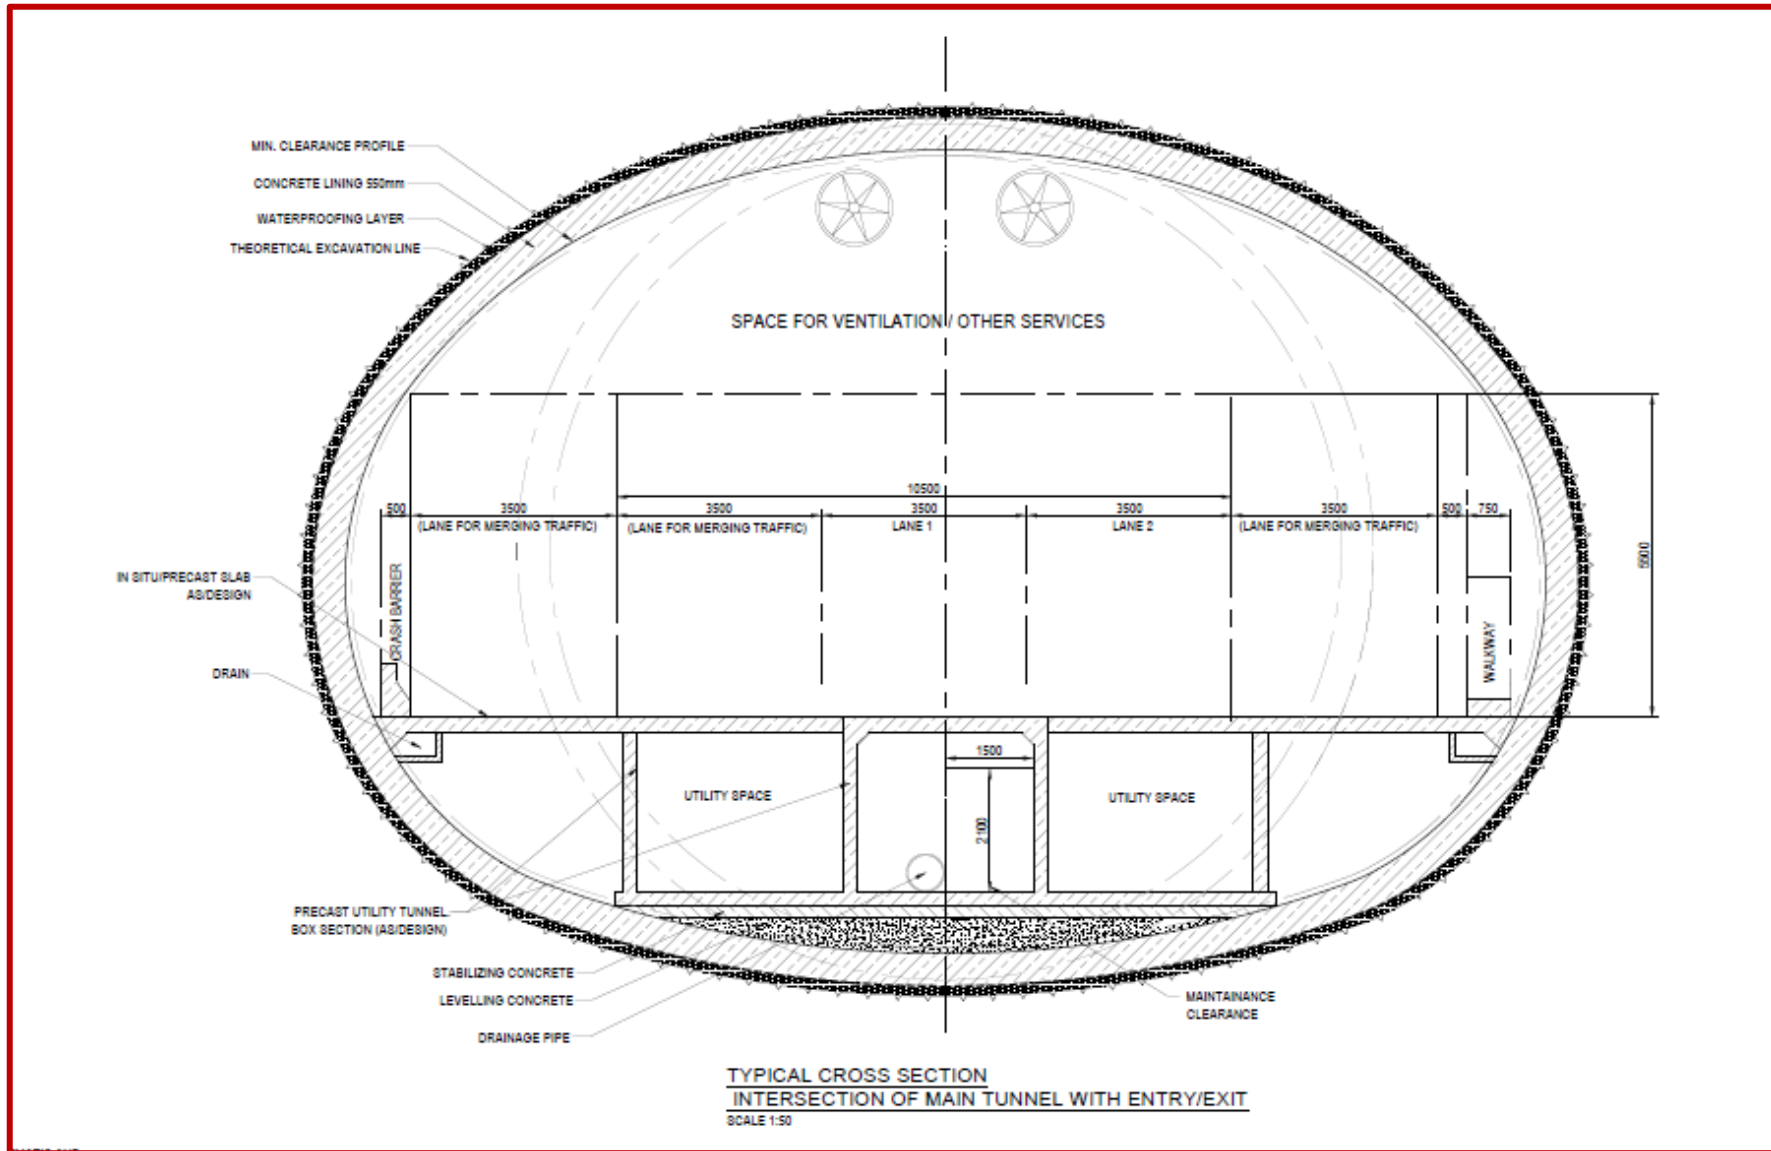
Typical Cross Section for merger section of Entry/ Exit Ramps & Main Tunnel
